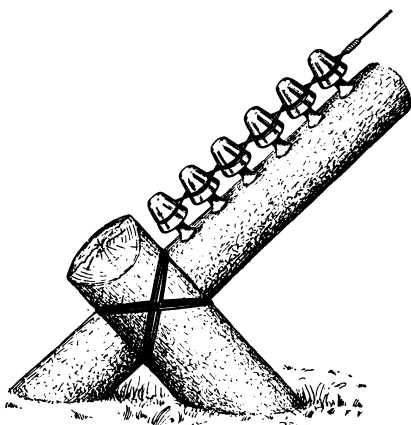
AERIAL LINE CONSTRUCTION, LONG SPANS, ADDITIONAL METHOD OF TERMINATING.
